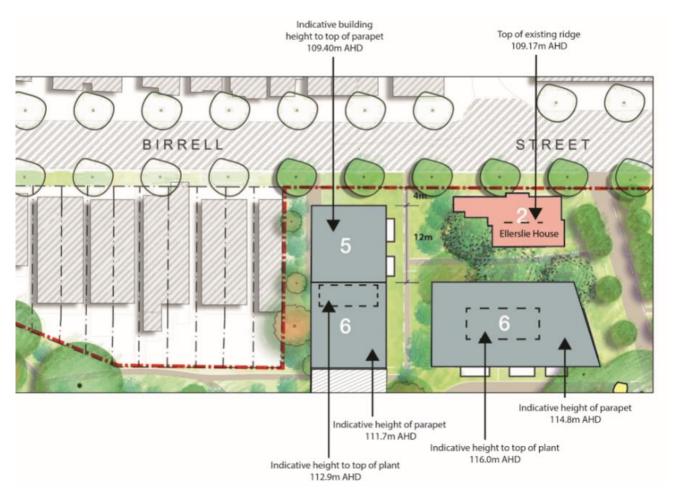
Proposed Birrell Street setbacks in relation to Ellerslie House
